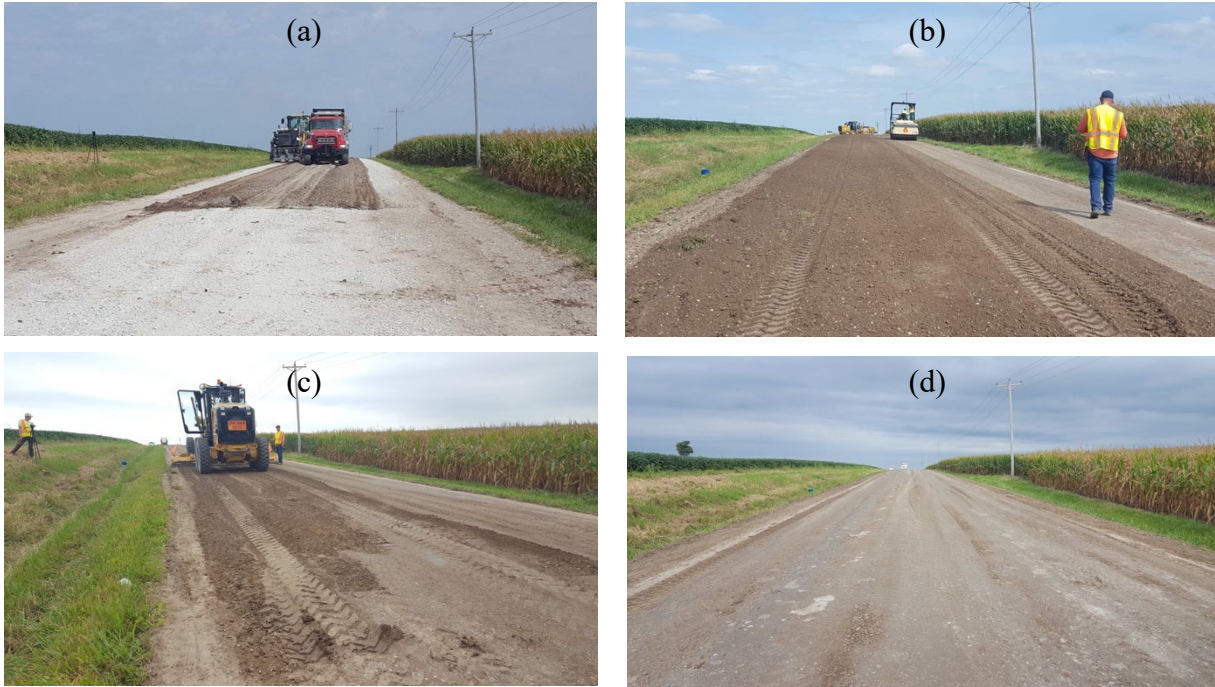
Construction of Claycrete section in Washington County: (a) milling stabilizer into aggregates and subgrade, (b) compacting with smooth drum vibratory roller, (c) blading surface, and (d) finished surface
